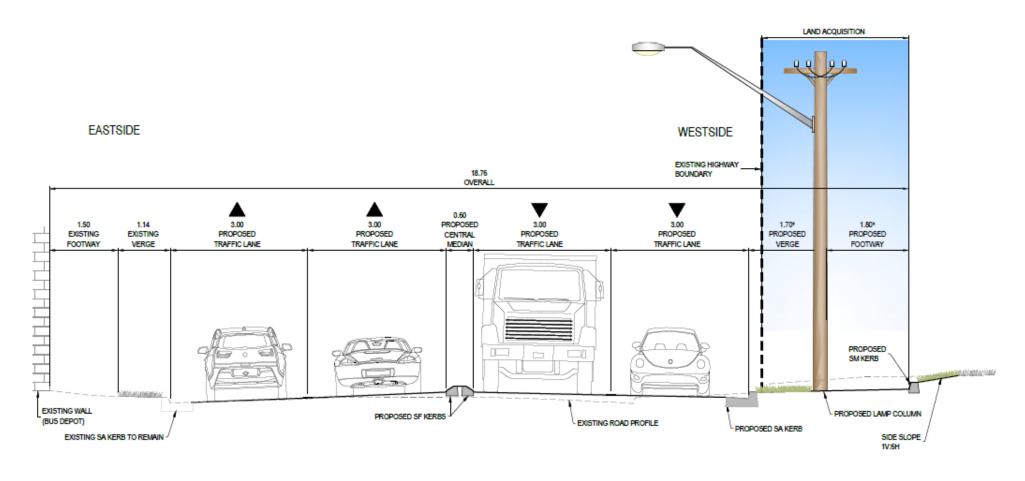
View of a typical cross section showing the proposed road design on Parramatta Road at the turning bay
